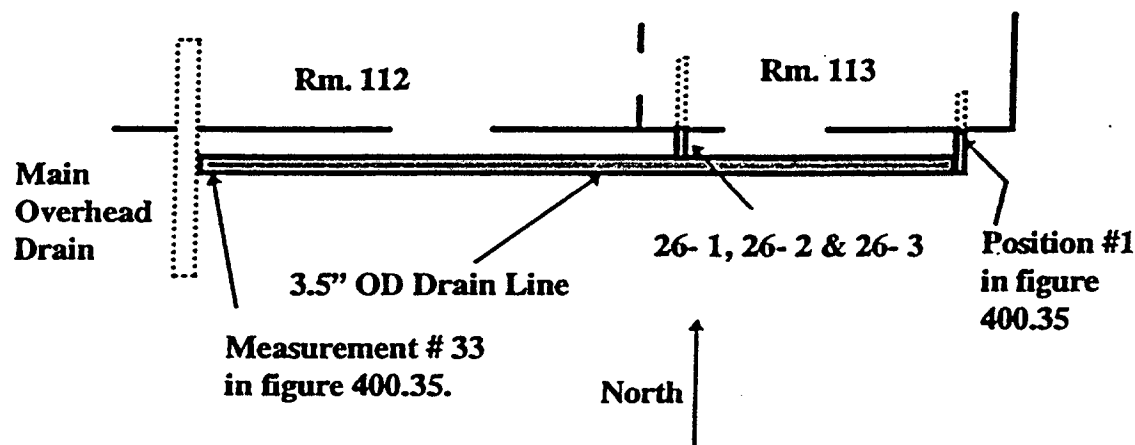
35. External Survey of Pipe From DU Room and Room 204 Just Outside of Room 112 to Main Overhead Drain, RSR # 13.
